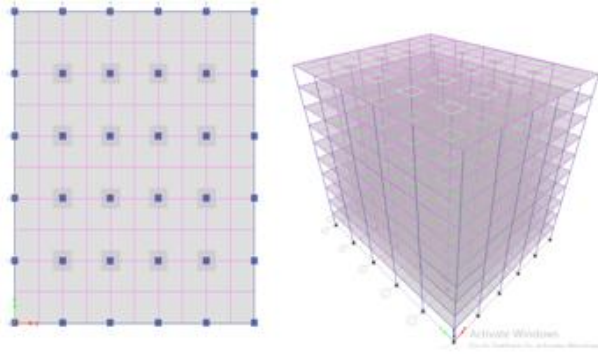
Plan and 3-D view of proposed flat slab building
